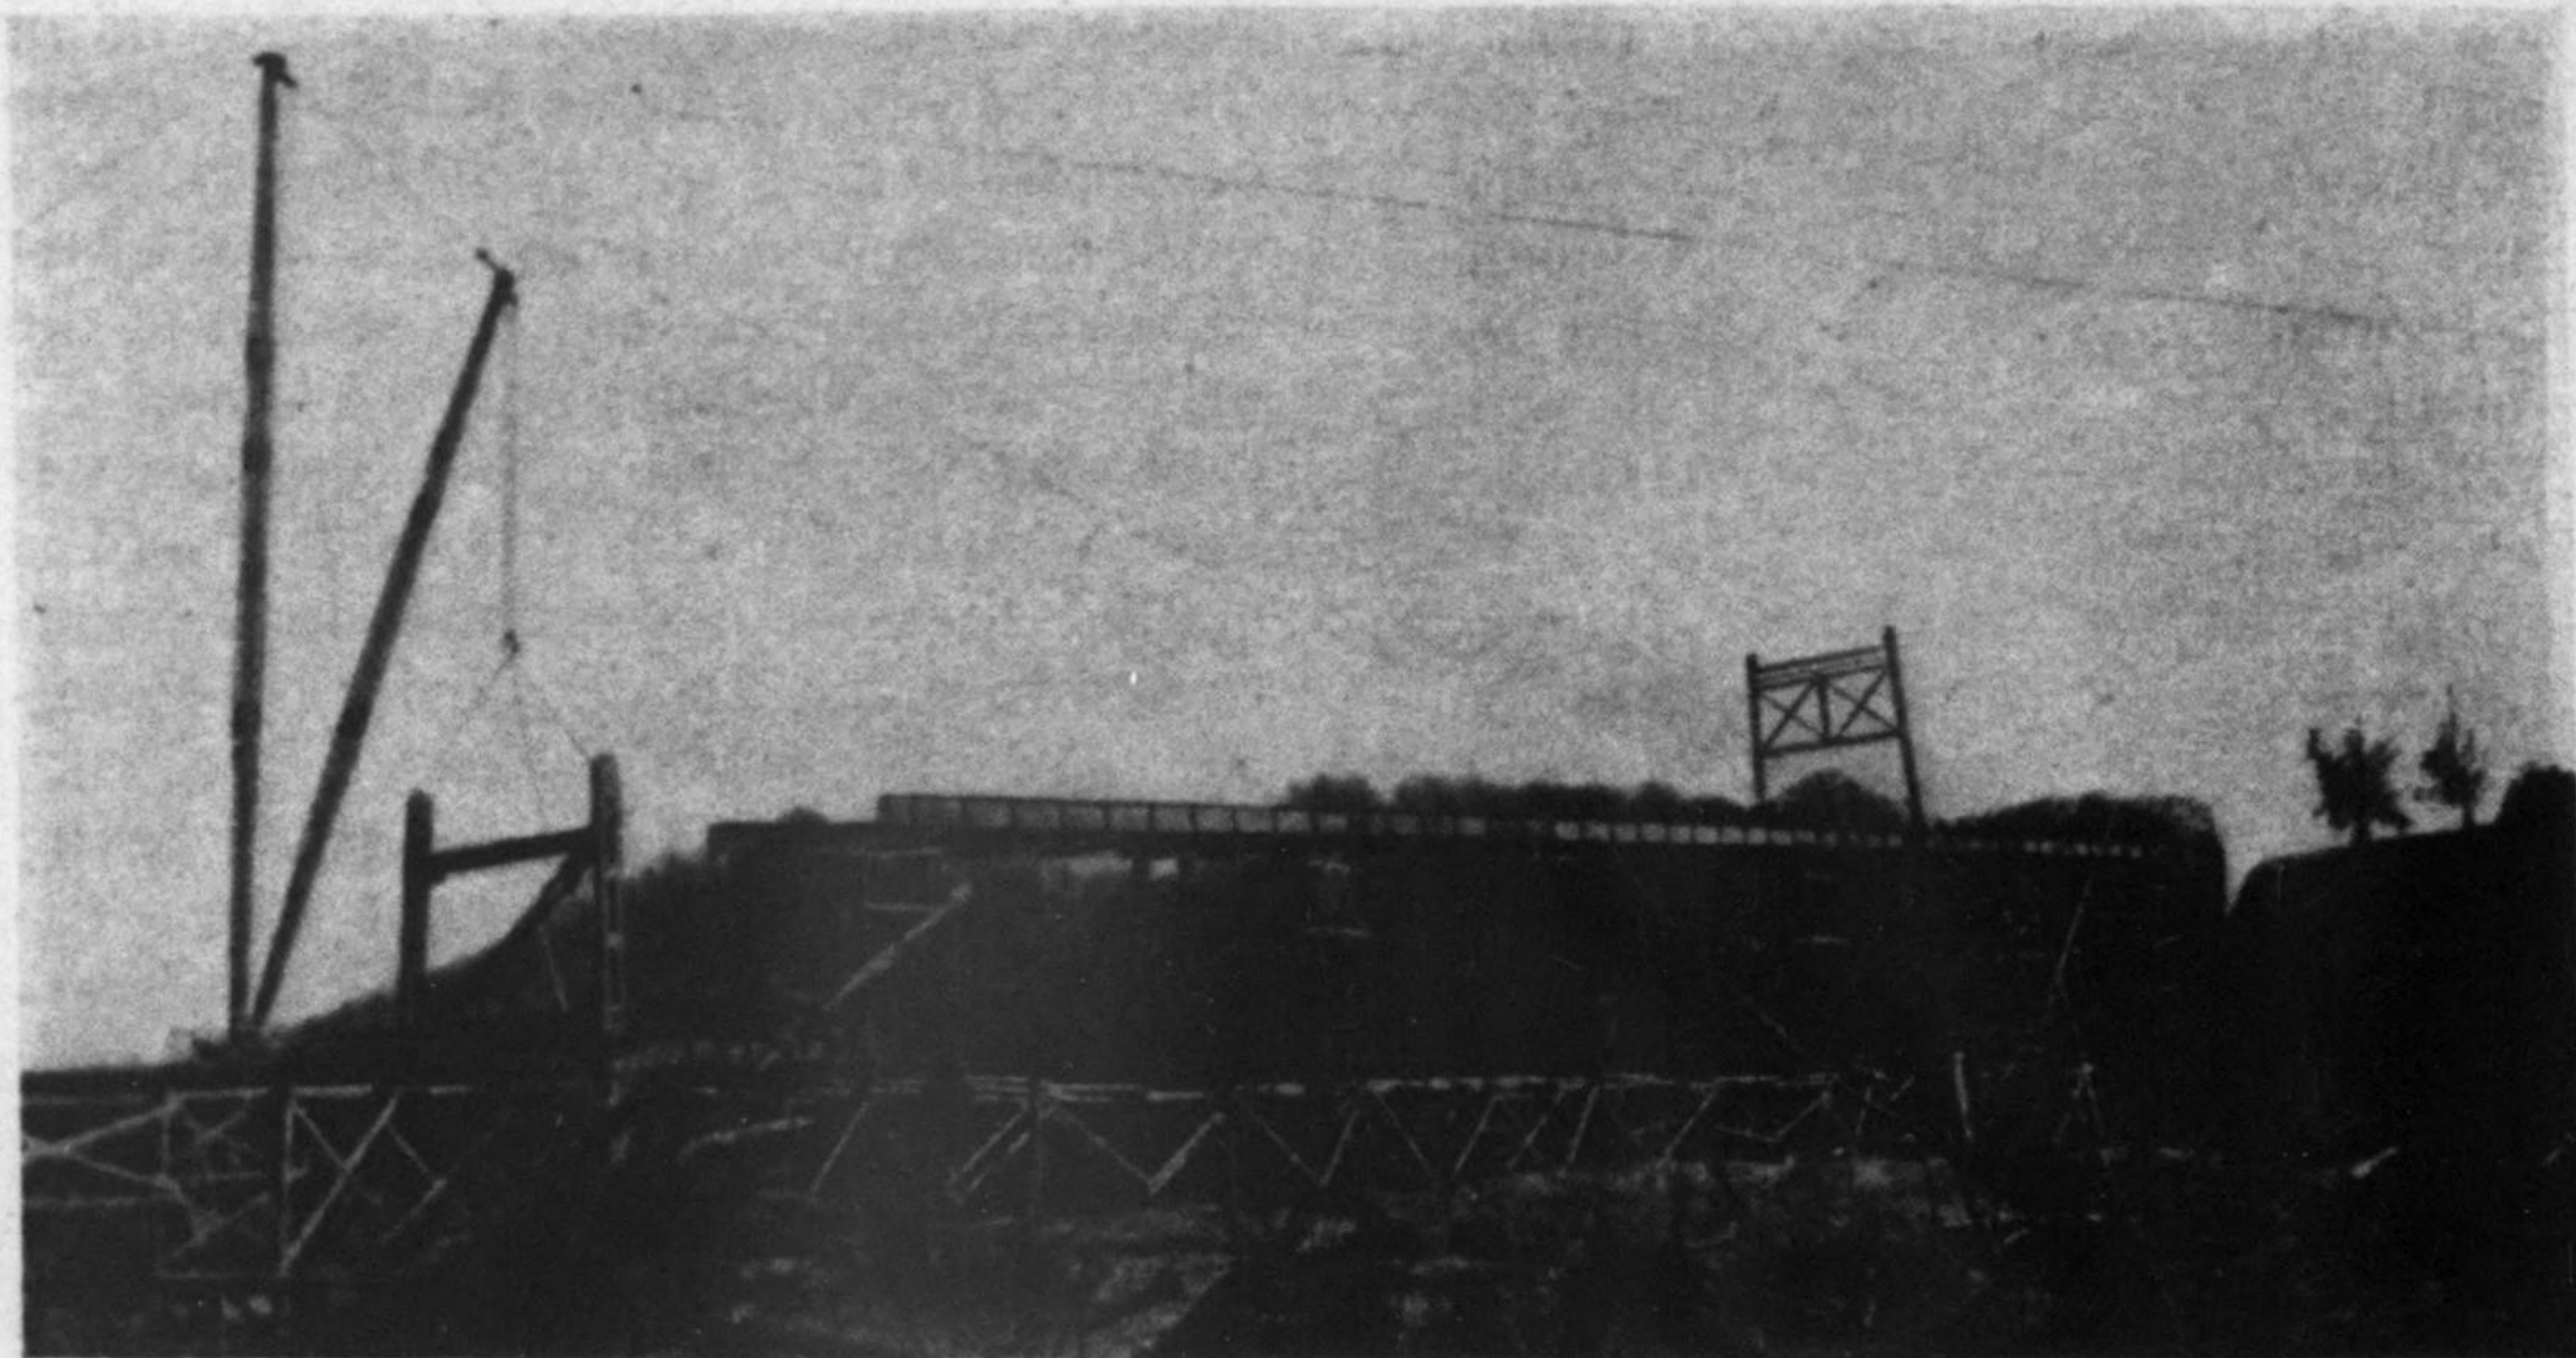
Bridge superstructure, except cable system, was erected complete in one pass of a guy derrick.
